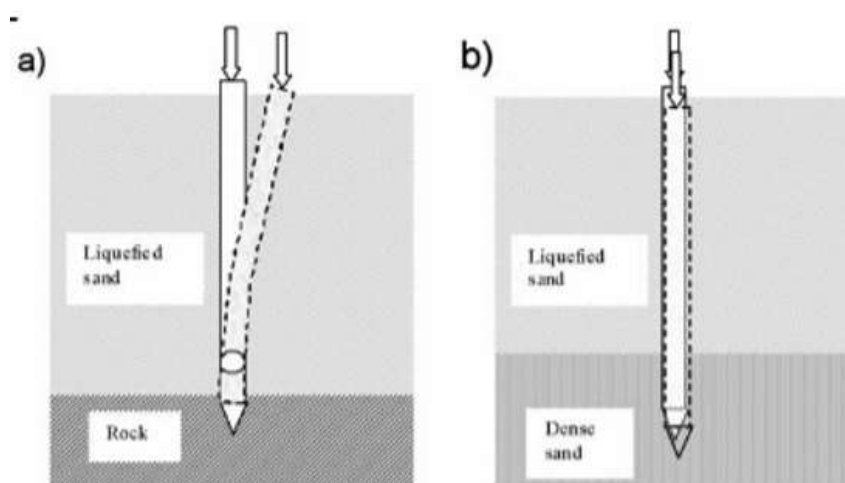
Modes of collapse for single piles in liquefiable soil (a) buckling instability (b) bearing failure
